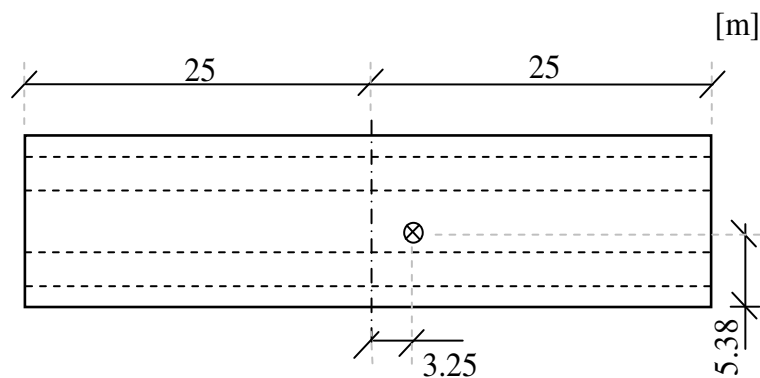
Position of the concentrated load applied on the bridge deck slab between the girders.
